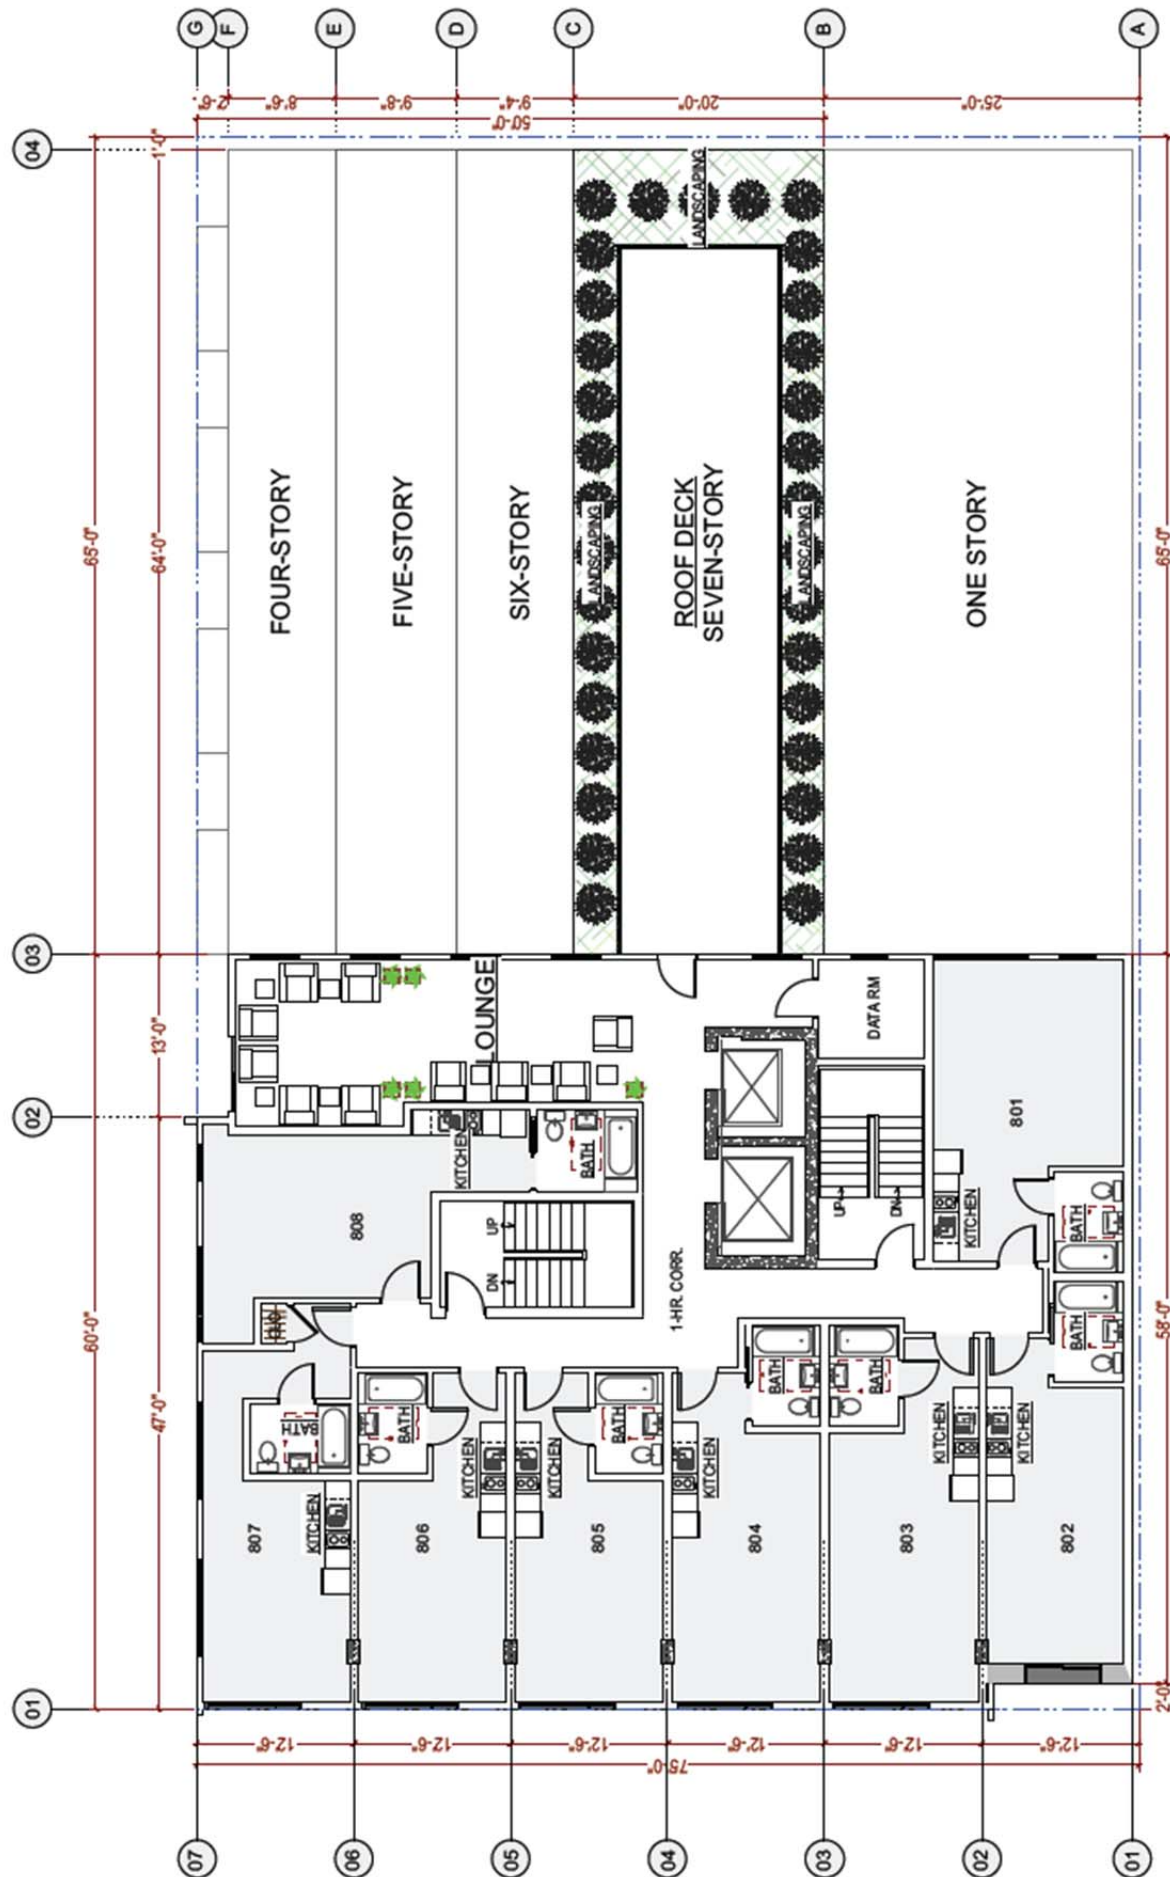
PROPOSED EIGHTH FLOOR PLAN
